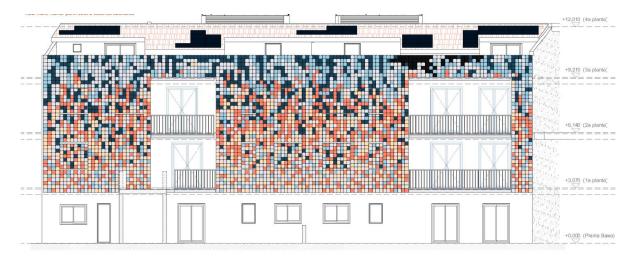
BUILDING FAÇADE, WEST ELEVATION
